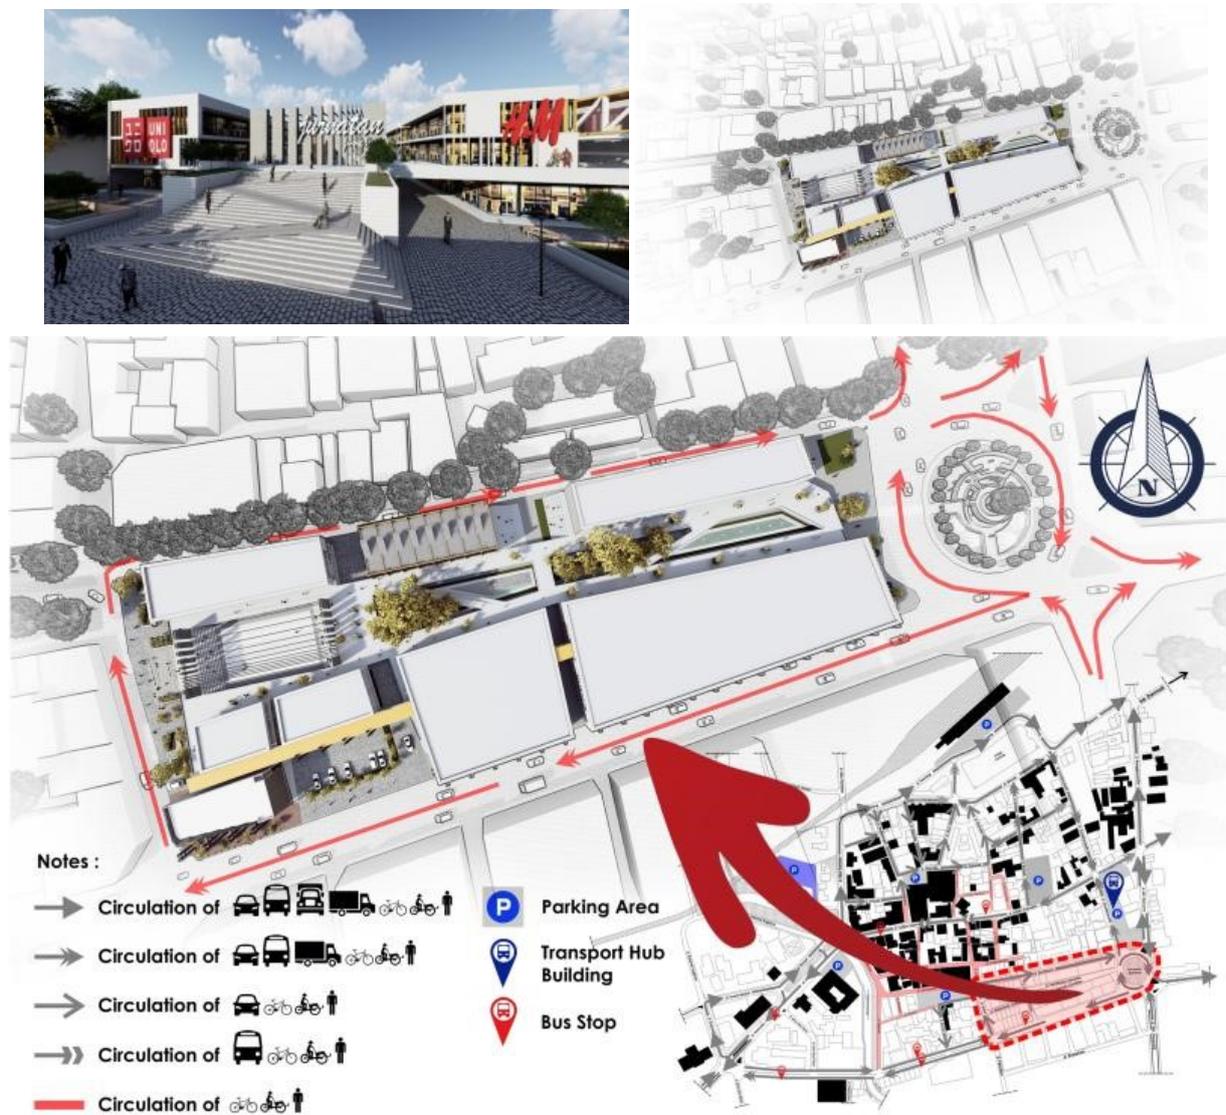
Circulation Plan for Jornatan Area (Authors, 2019)
